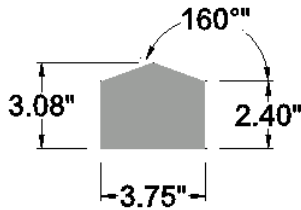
Elevation view (all irregular shape models sections with gable roof)
